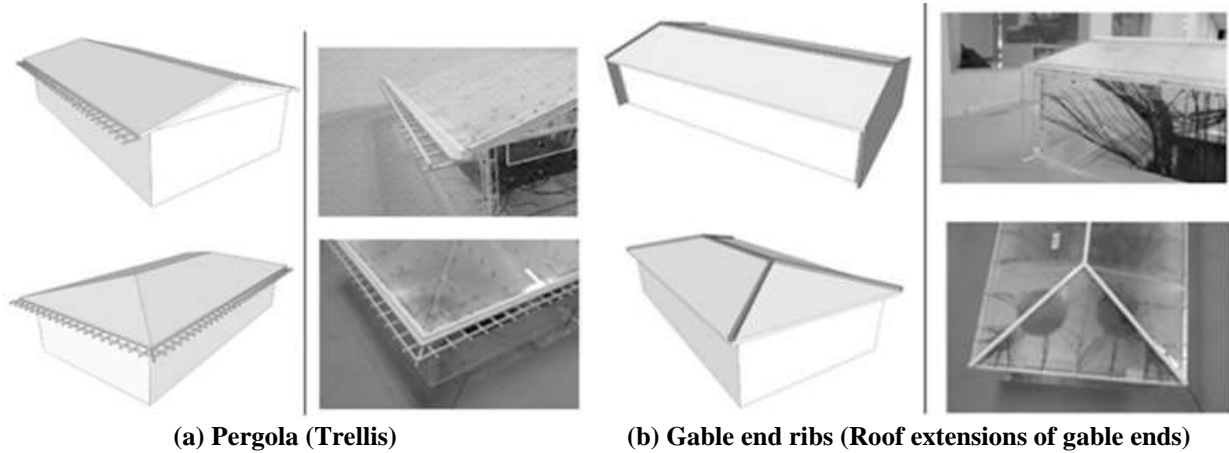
Architectural elements installed on the roof (Bitsuamalak et al. 2013)
